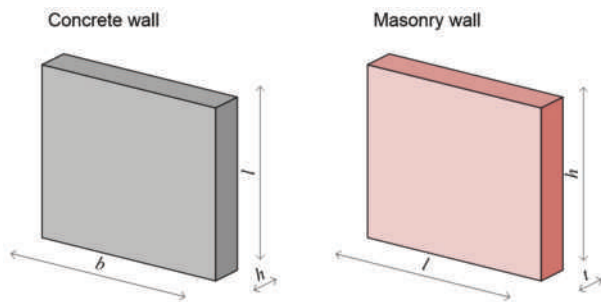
Different terminology of a concrete (EC2) and masonry (EC6) wall
